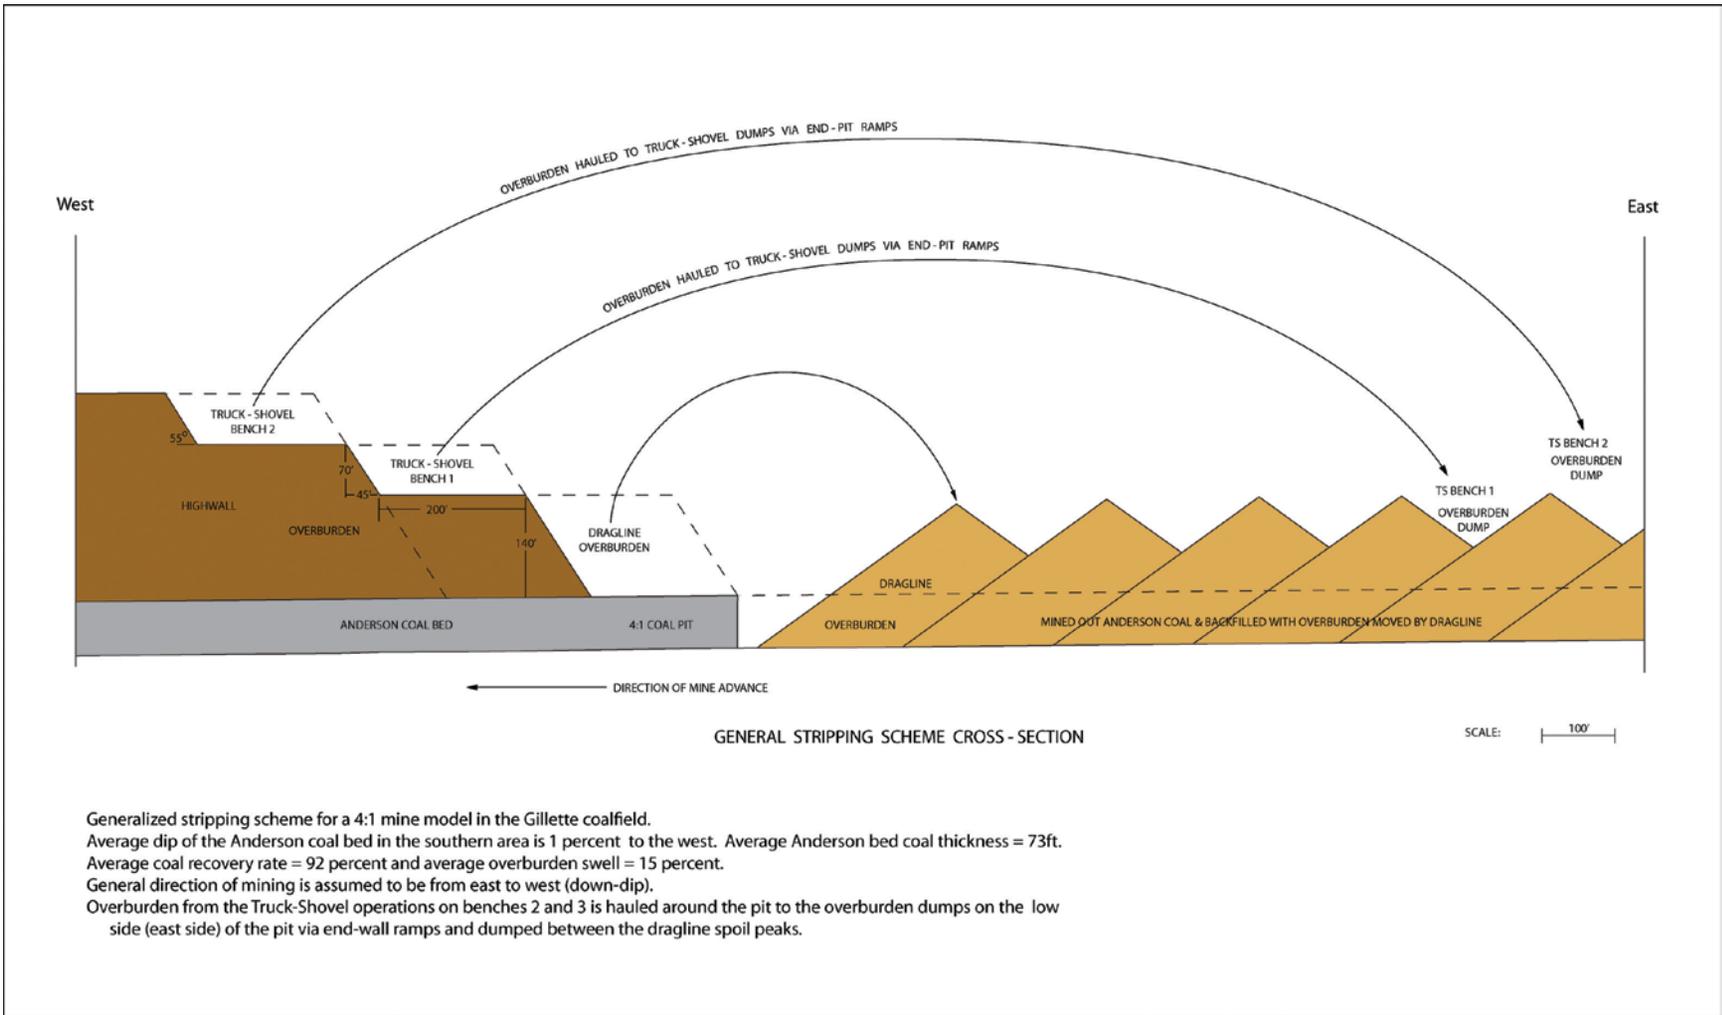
West to east, Gillette overburden removal cross-section of the 4:1 ratio mining area, showing truck-shovel and dragline highwall benches, low wall dumps, schematic truck haulage routes, and the Anderson coal bed.
